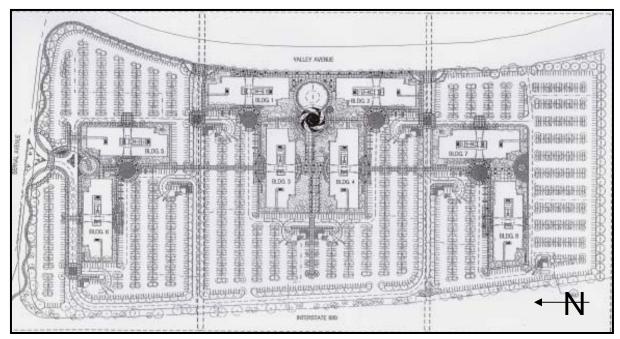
Approved PUD Development Plan for the Pleasanton Gateway site.
